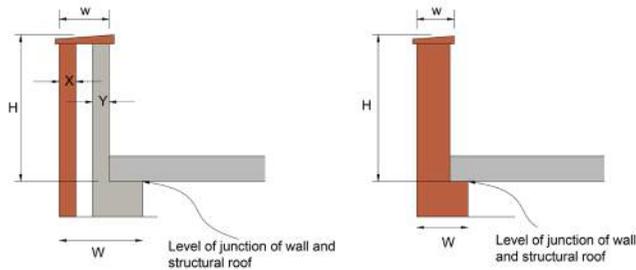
Maximum height of parapet walls (to be read in conjunction with Table 4)
